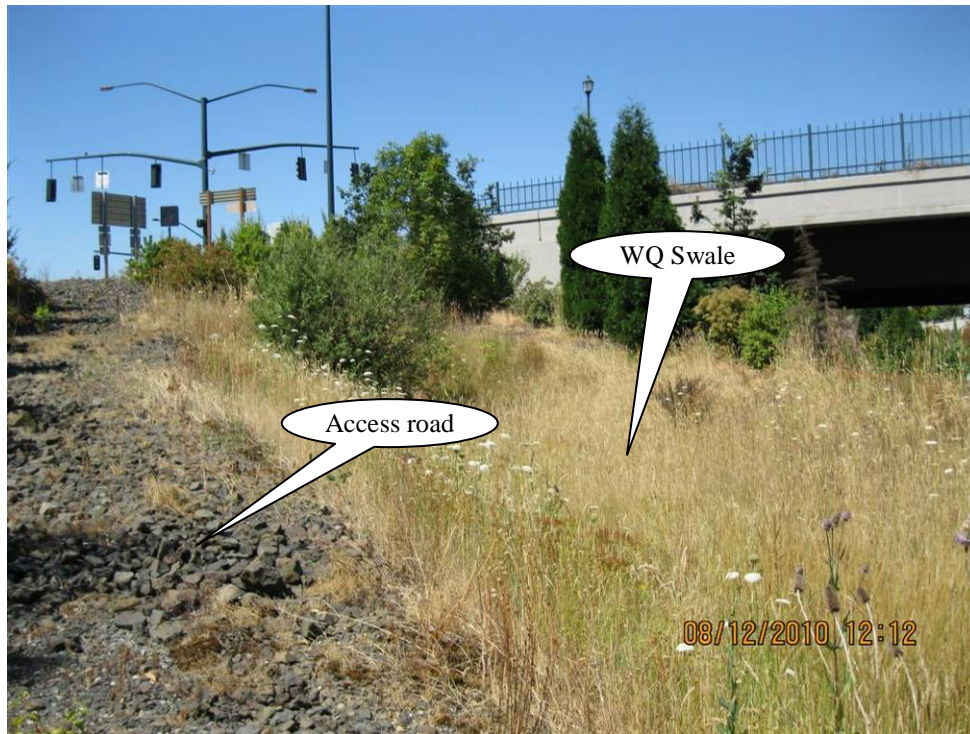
Looking west toward WQ Swale. Access road is located to the left.
